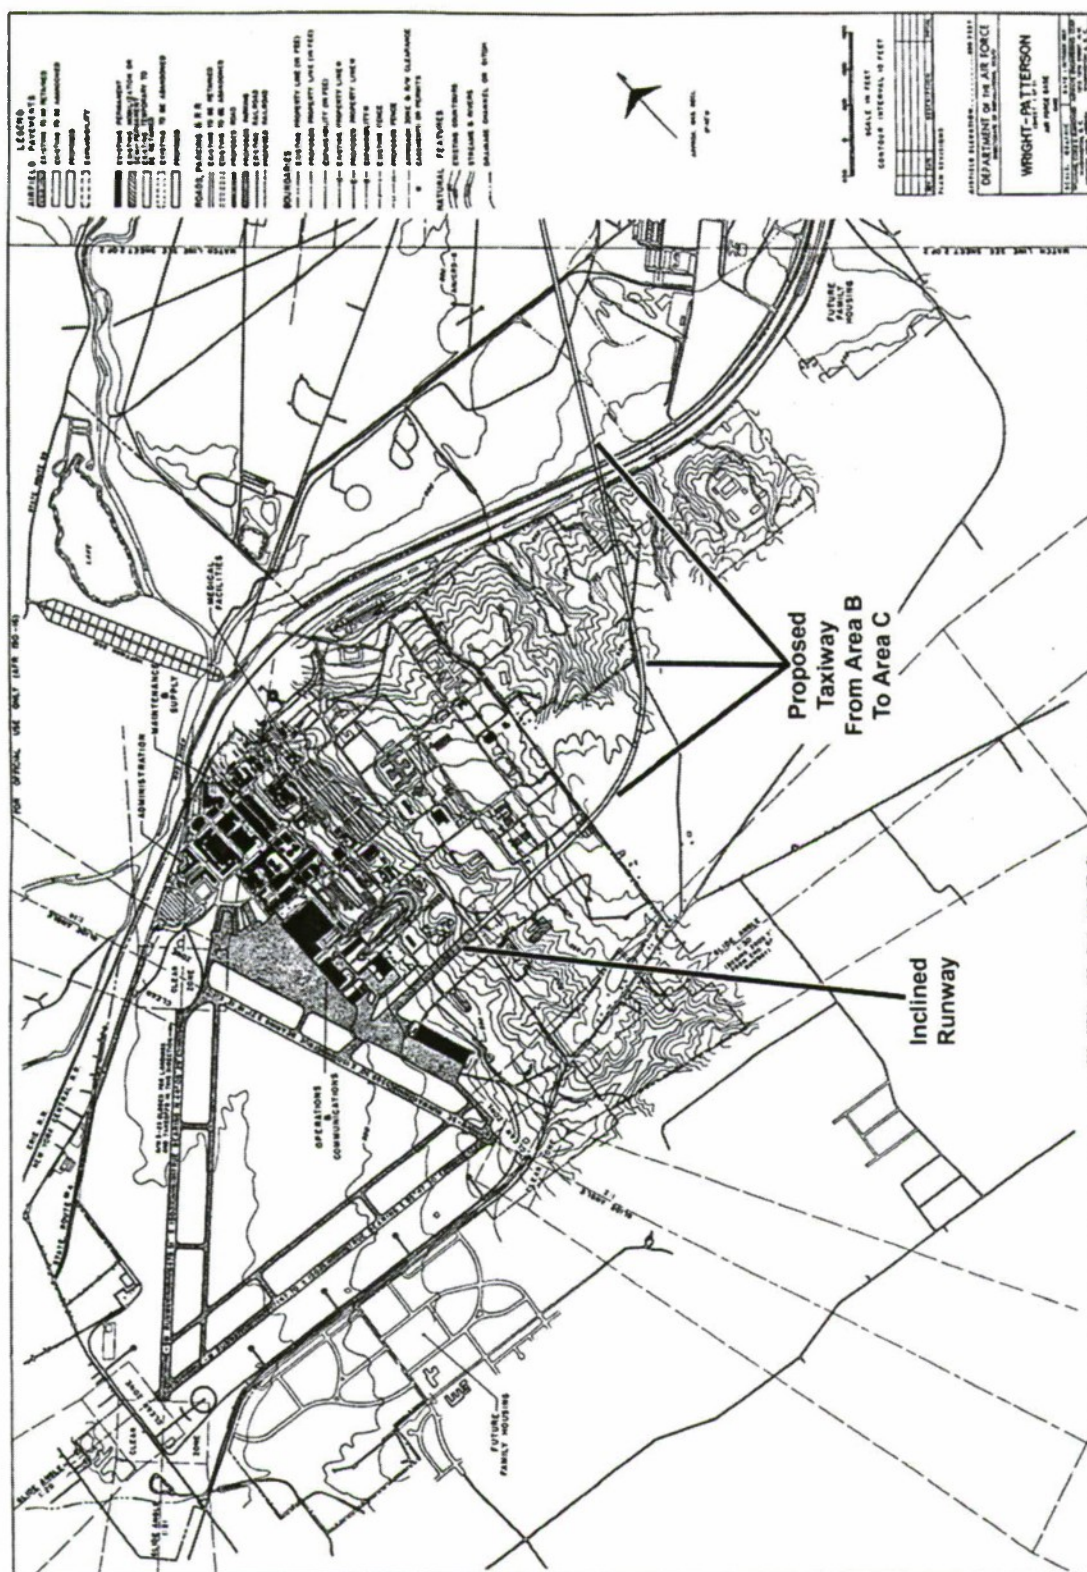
Directorate of Installations, Headquarters United States Air Force, Master Plan for Wright-Patterson Air Force Base, Sheet 1 ("Wright Field"), October 1957. Proposed "taxiway" connecting the inclined runway in Area B to a proposed parking apron in Area C, center. Annotations added. Collection of K.J. Weitze.
